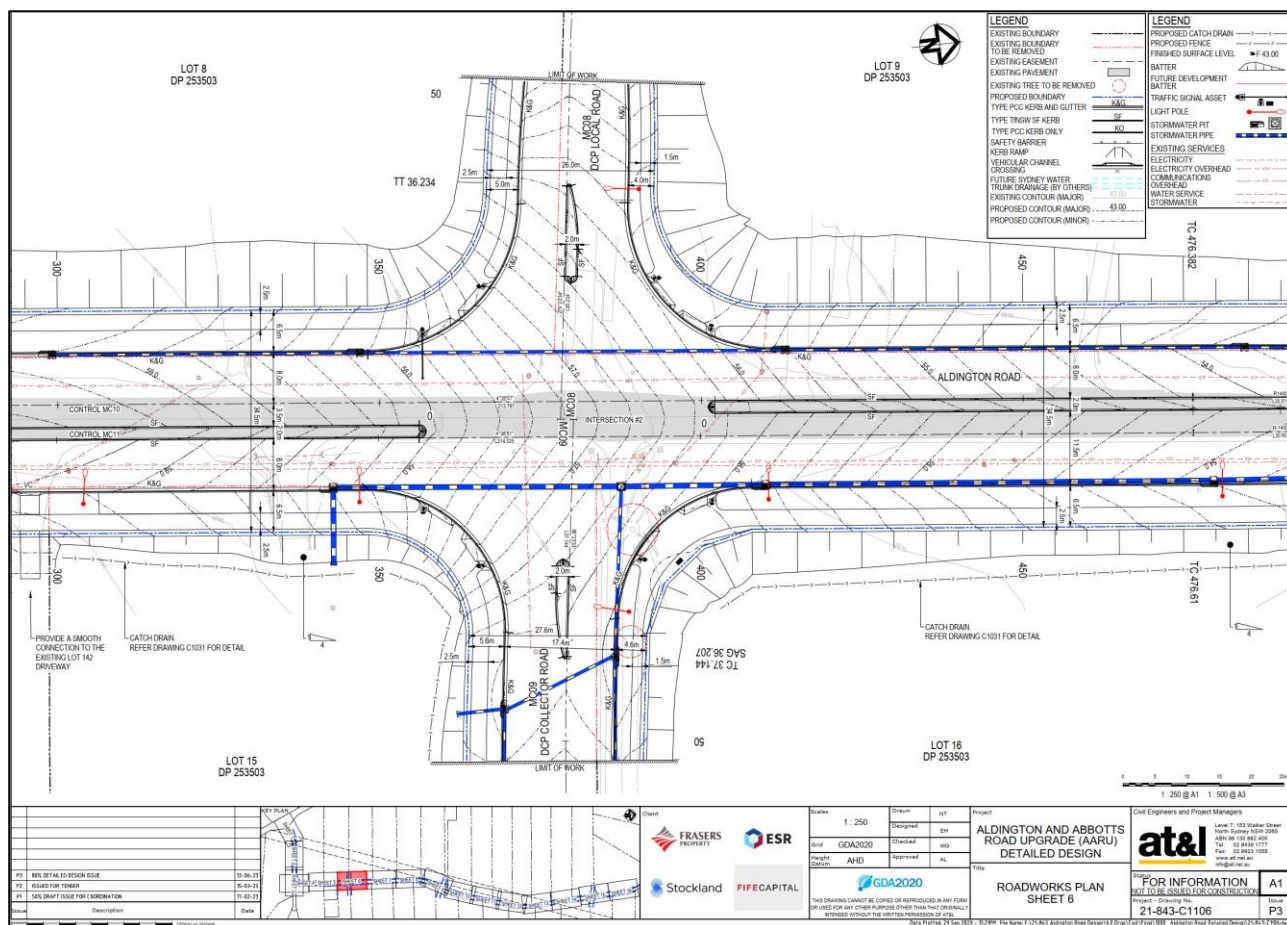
Proposed Aldington Road / Site Access Road Intersection
